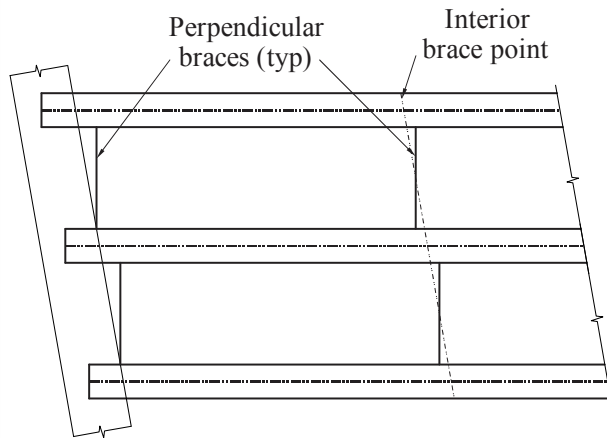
Perpendicular brace placement on skewed bridge (plan view)
